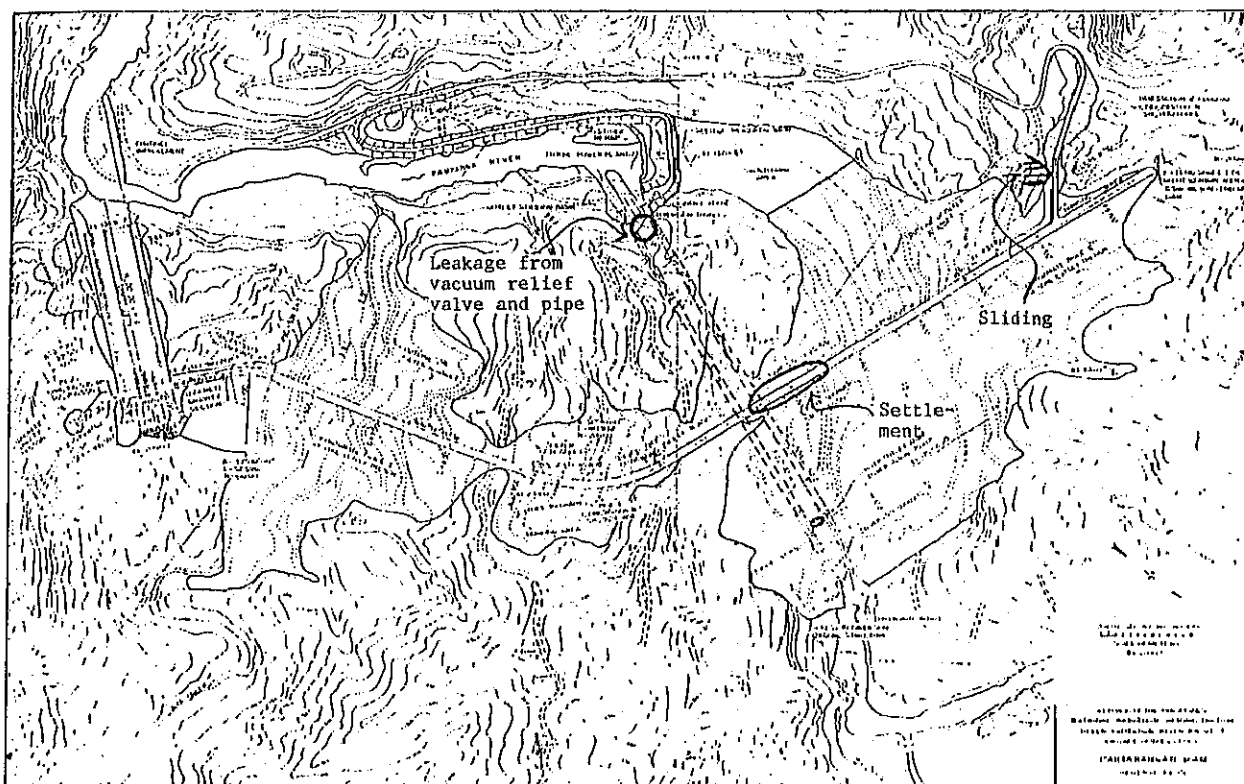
Plan of Pantabangan Dam and Aya Dam
